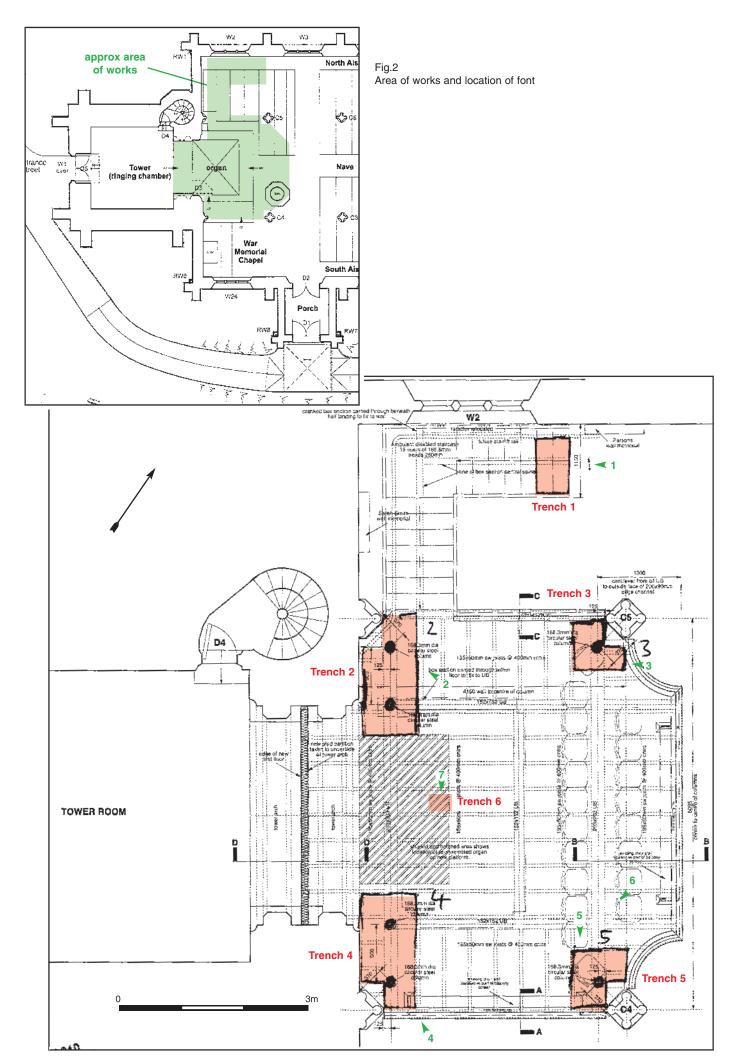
Plan showing location of foundation trenches in detail, with plate orientations in green
